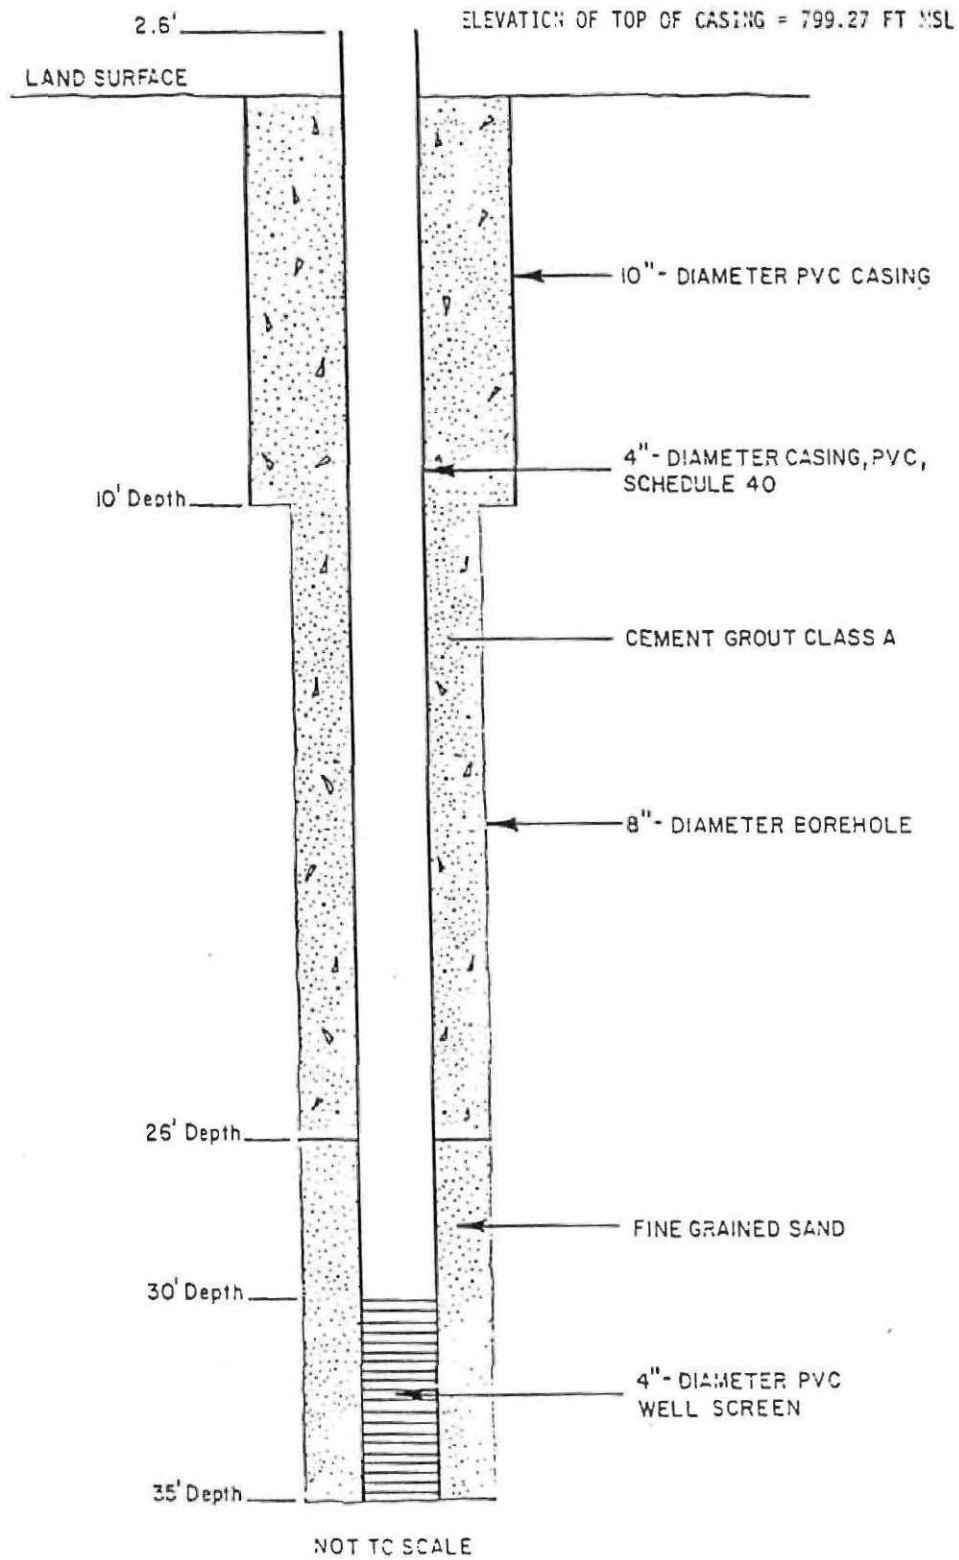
Schematic Diagram Showing the Well-Construction Details of P-16-W.
